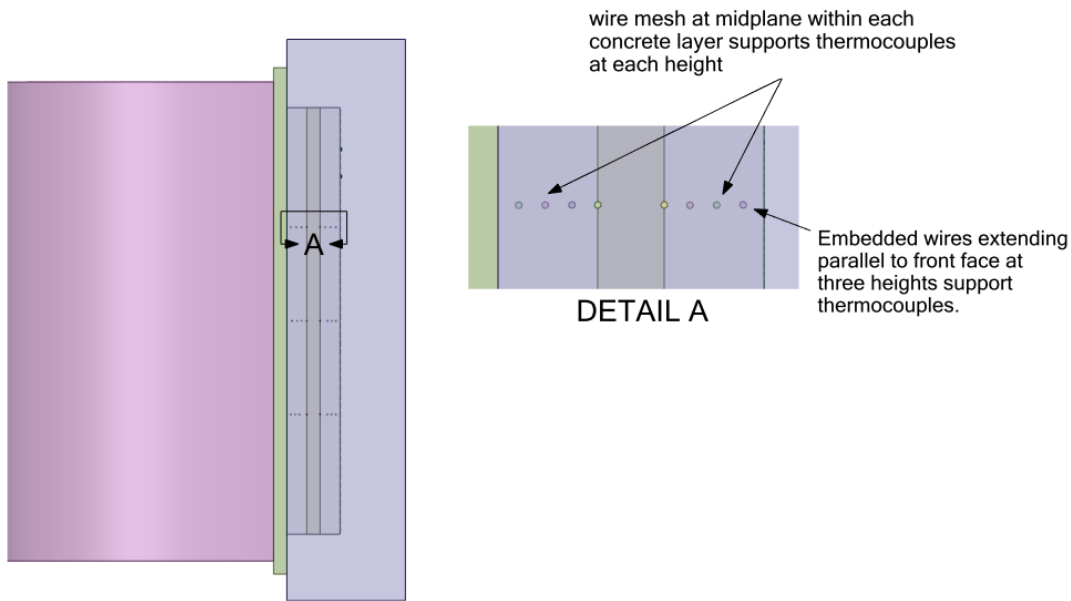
Formed concrete wall: Arrangement of embedded thermocouples.
